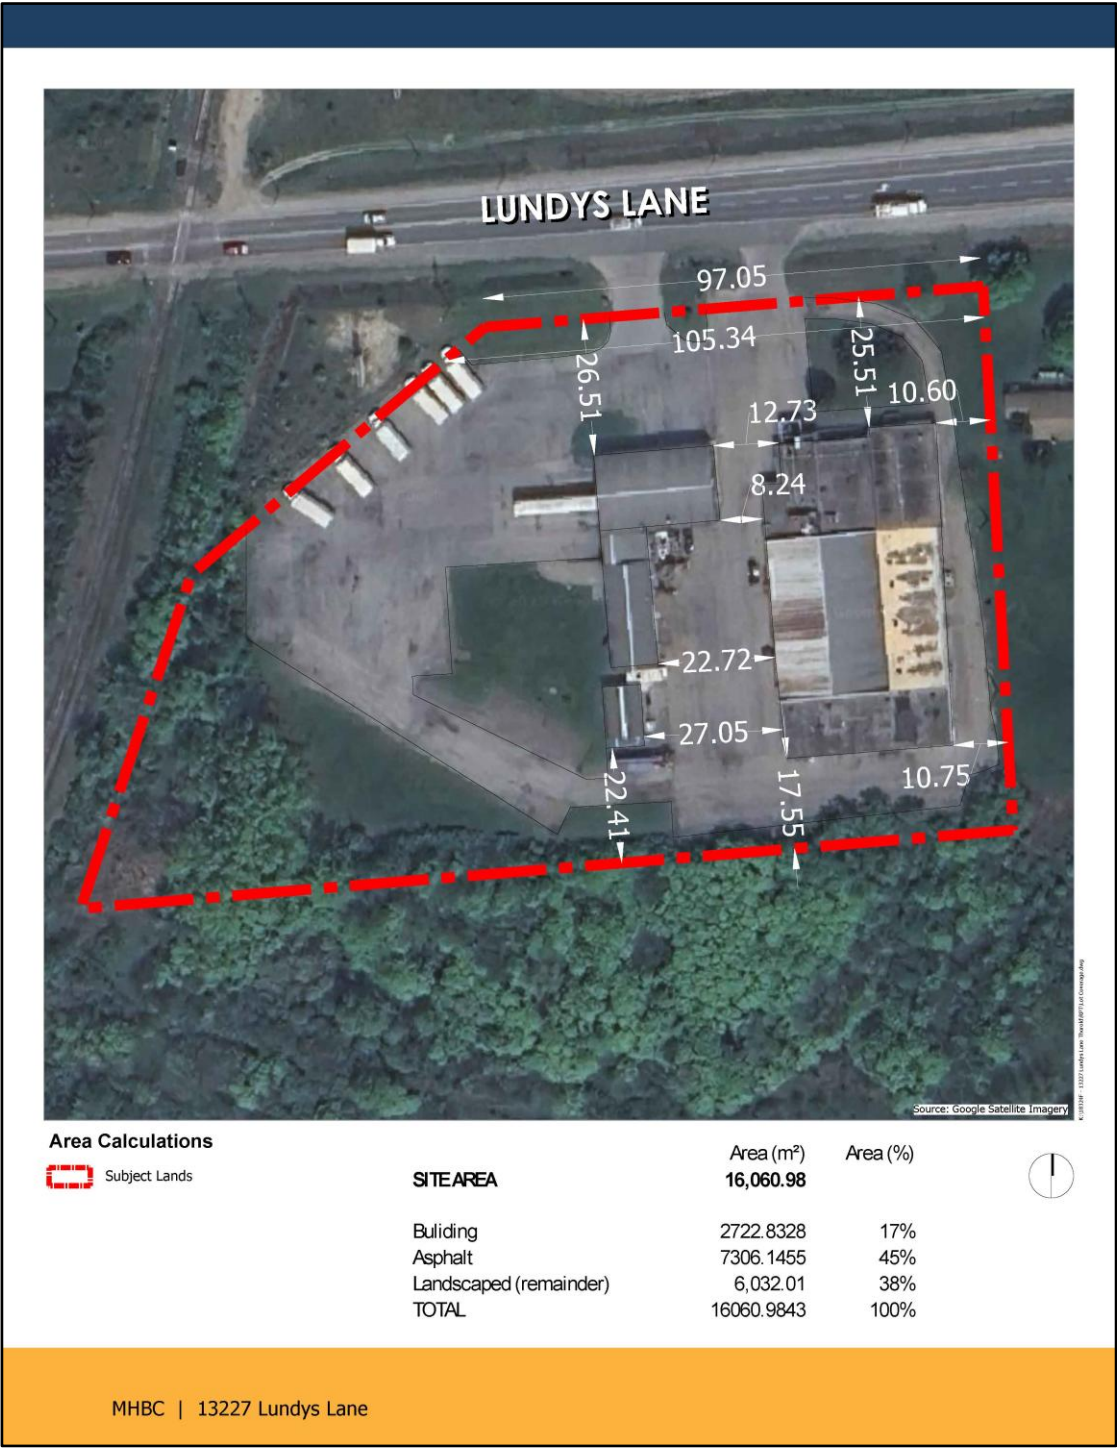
Existing structures on the subject lands which will accommodate the proposed use.
